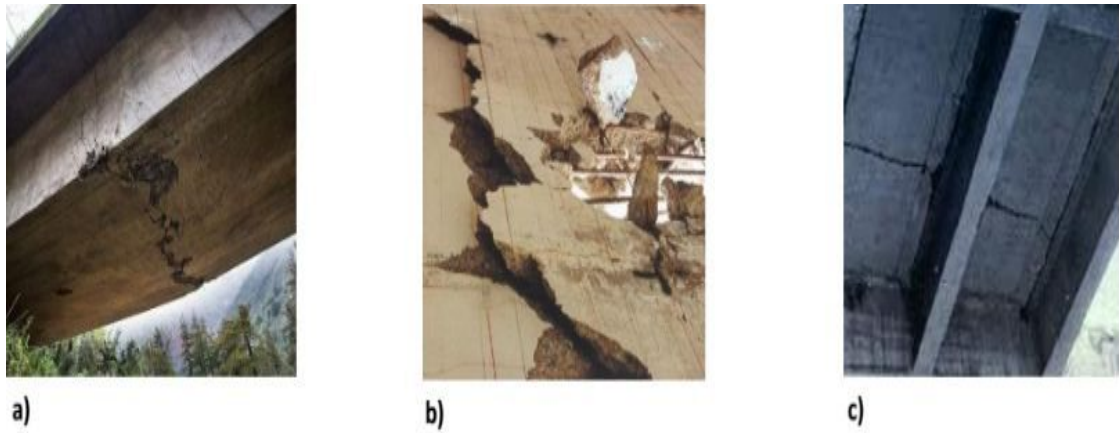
Failure in concrete bridge, a) Flexural cracking (Pfeiffer Canyon Bridge), b) Shear failure of a bridge deck., c) Crack in concrete bridge deck
